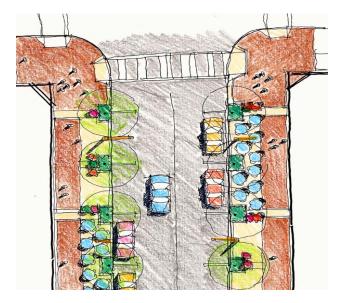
Plan of proposed Simpson Street improvements showing possible pavement treatment and dining areas
